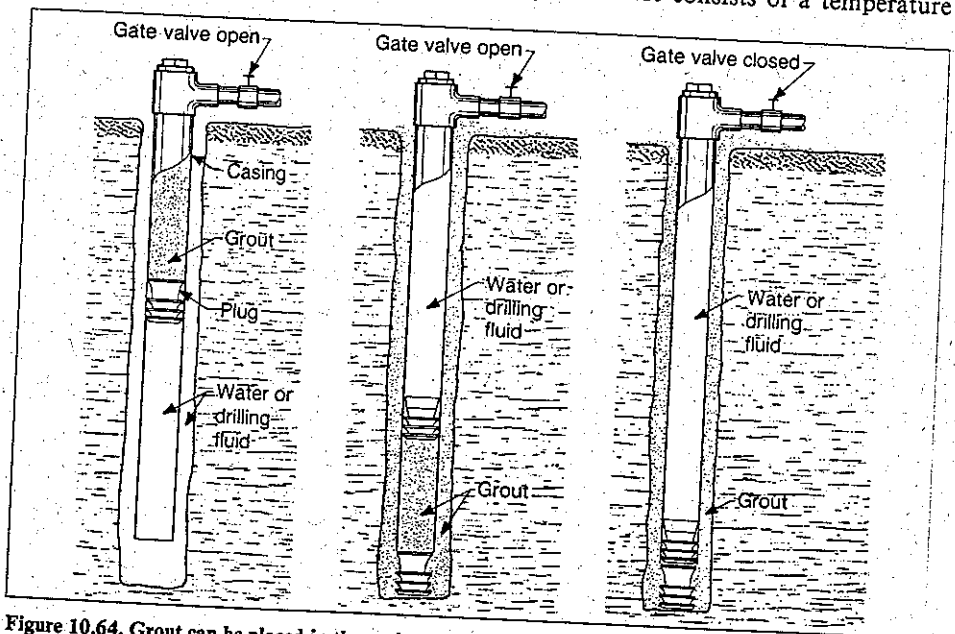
Grout can be placed in the casing and then forced out the bottom and up the annulus. This is called the casing method of placing grout. Plugs are used to separate the grout from the drilling fluid and the water used to drive the grout into place. The plugs and float shoe are drilled out after the grout hardens. The casing method of grouting was originally used in the oil-well industry.
